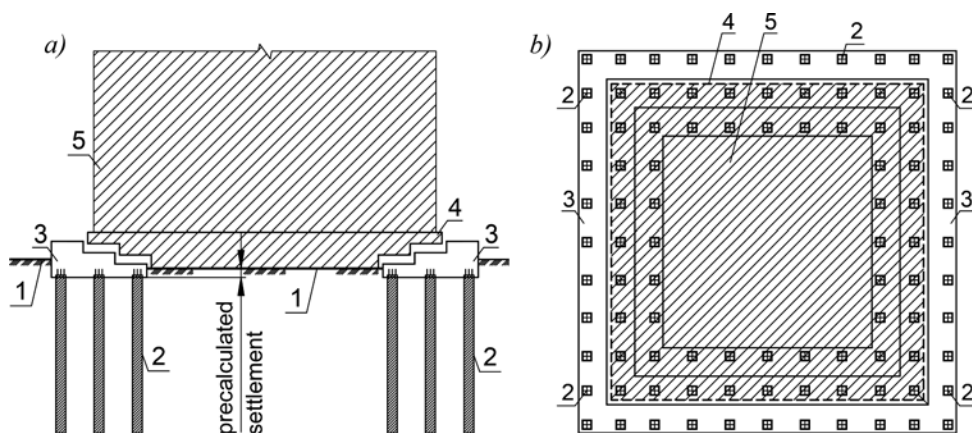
Scheme of construction of a raft-pile foundation: 1 – prepared soil surface; 2 – perimetral piles, united by a grillage; 3; 4 – foundation slab with designed configuration; 5 – high-rise building (RU patent No 2379425).
